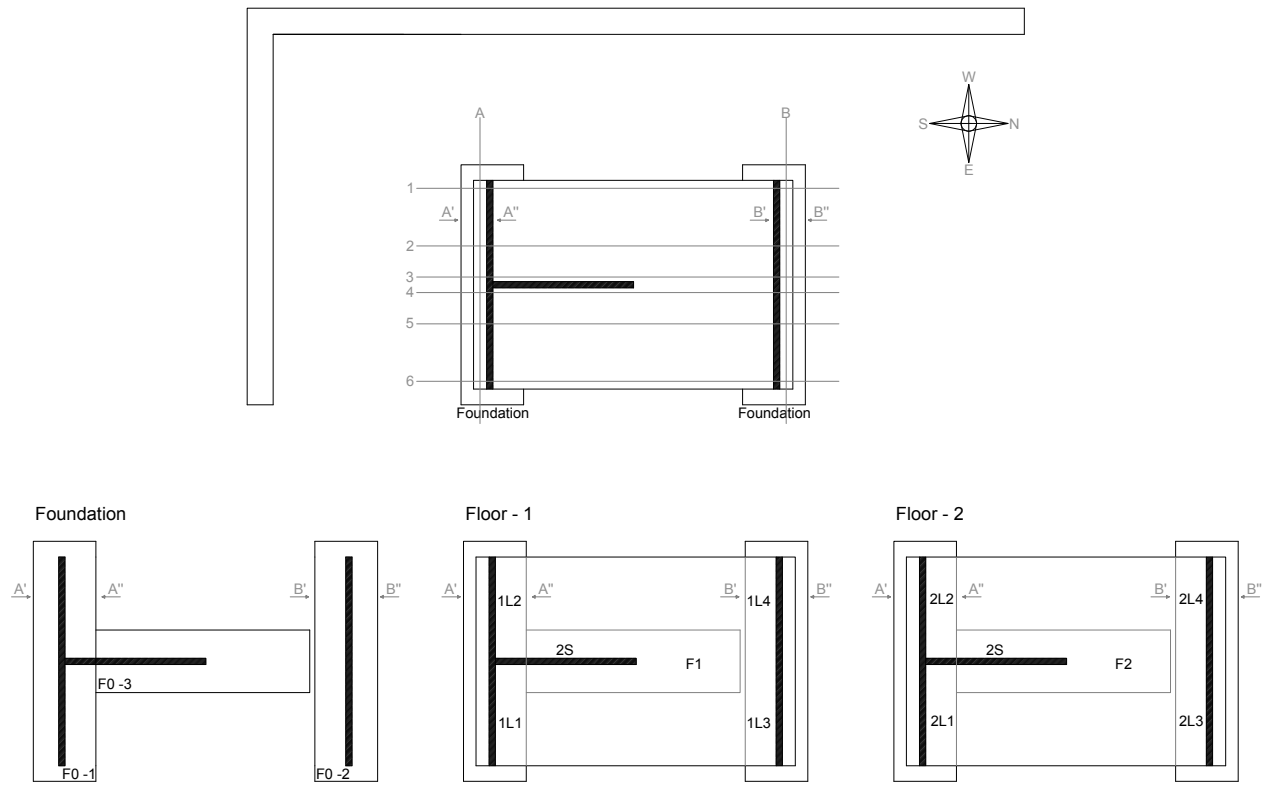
Plan views of EUC-BUILD4 specimen – position of the installed instrumentation.
